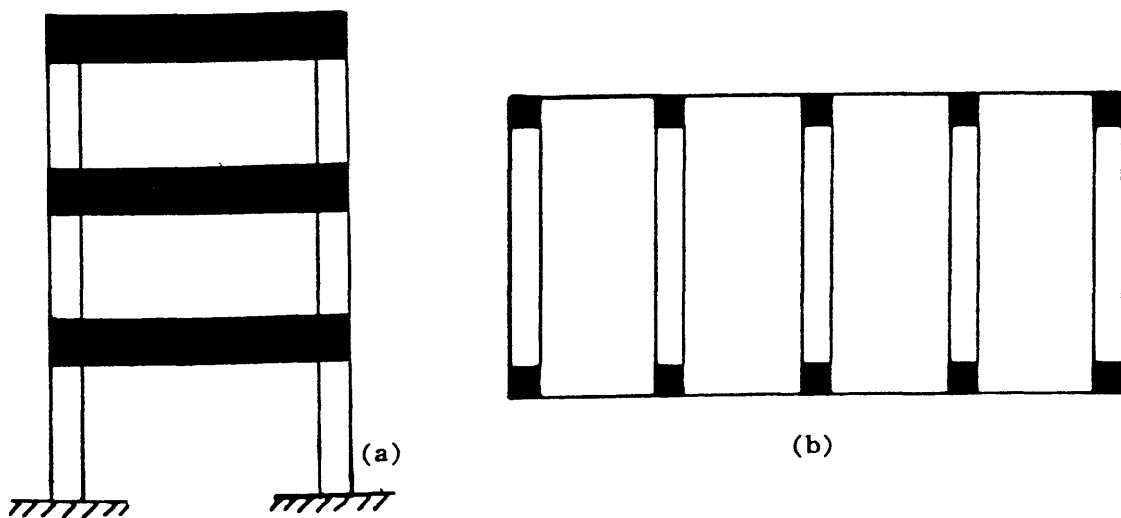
A typical shear building (a) A single bay (b) Plan view
